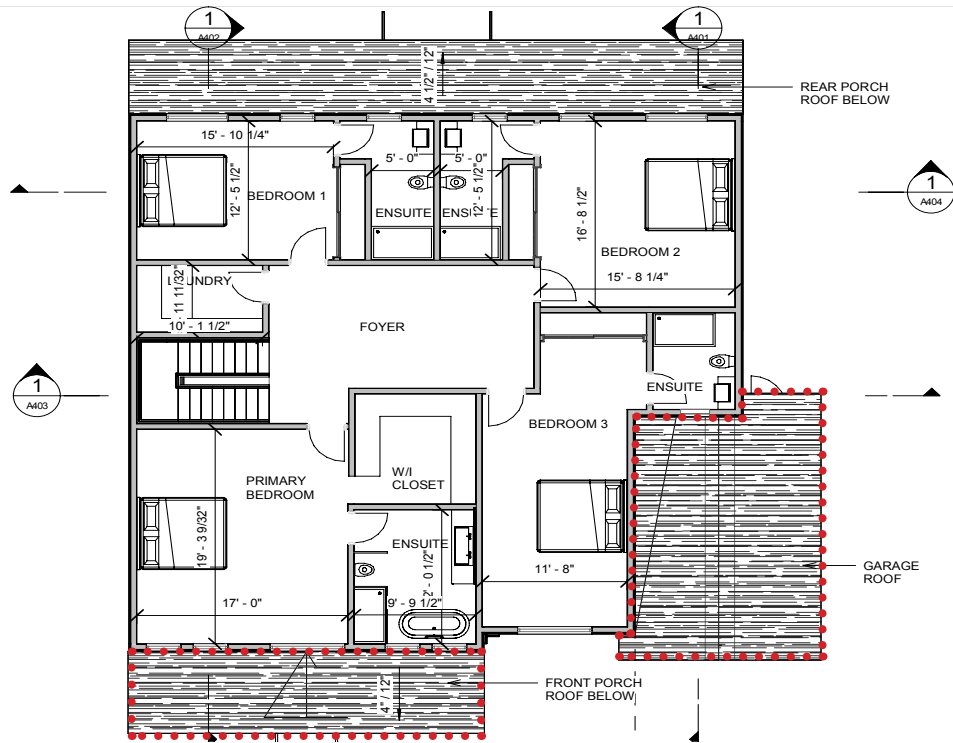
Second Storey Floor Plan. New Addition. Red dotted line indicates location of existing roof of front and garage to be incorporated into addition/renovation. Roof lines appear below second storey. Drawing by Third Layer Architects, 2021.
